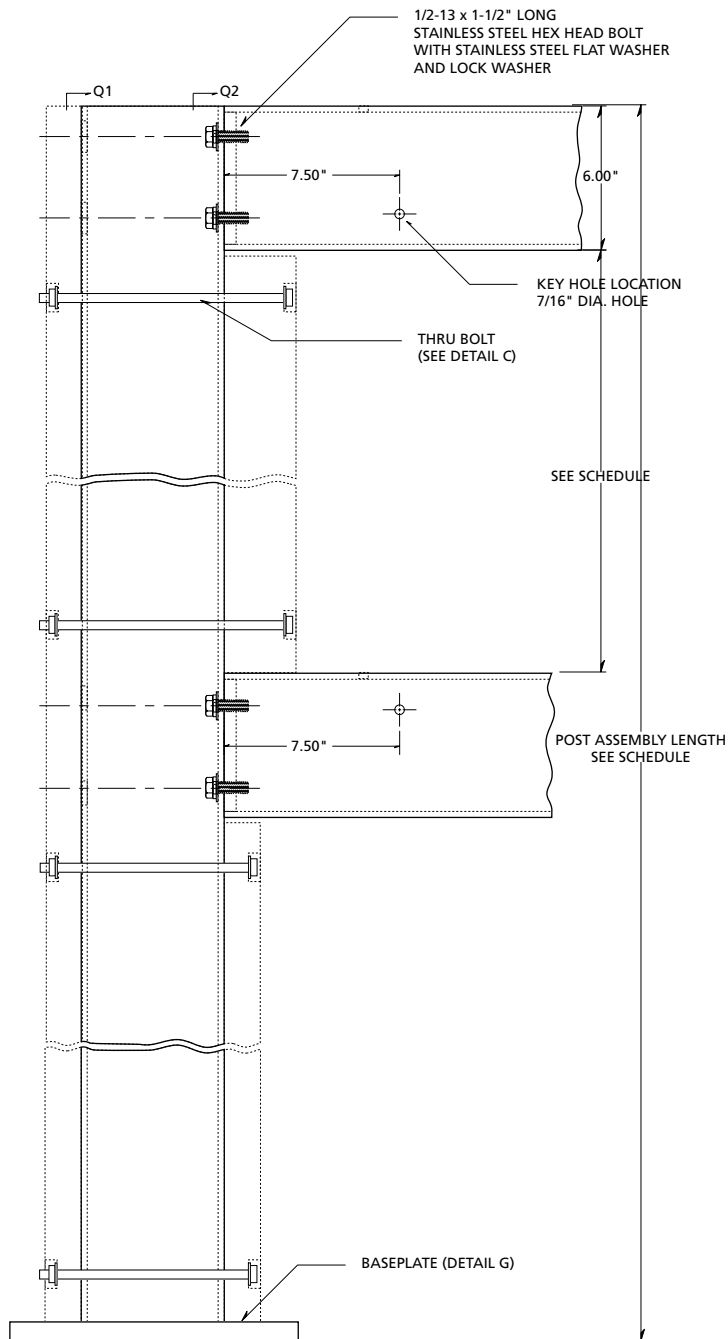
DETAIL POST ASSEMBLY 6 x 4 PLAN VIEW
